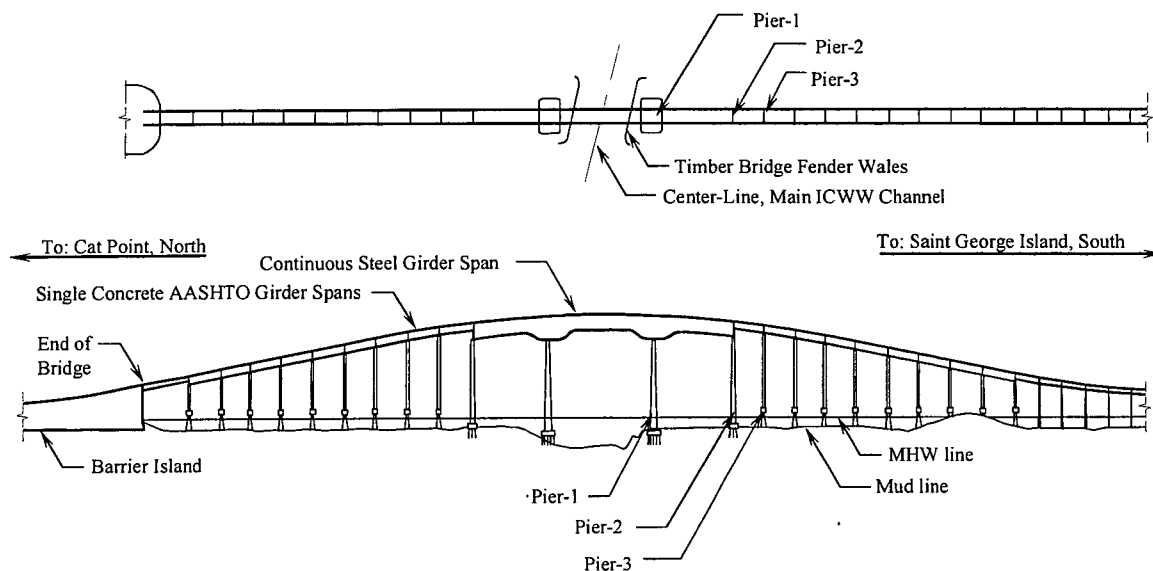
Elevation of Saint George Island Causeway Bridge
